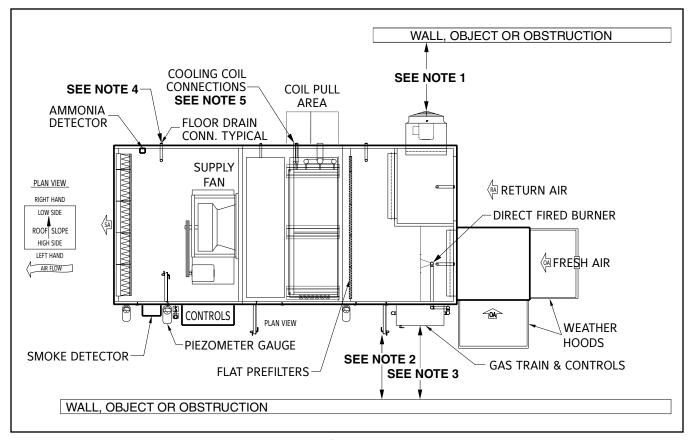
AcuAir System-to-Wall Spacing Requirements (Generic unit layout shown here. Please consult the order specific unit layout drawing before beginning site engineering.)
